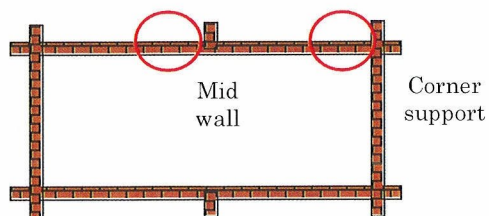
Plan view of overlapping adobe walls with mid wall side support.
